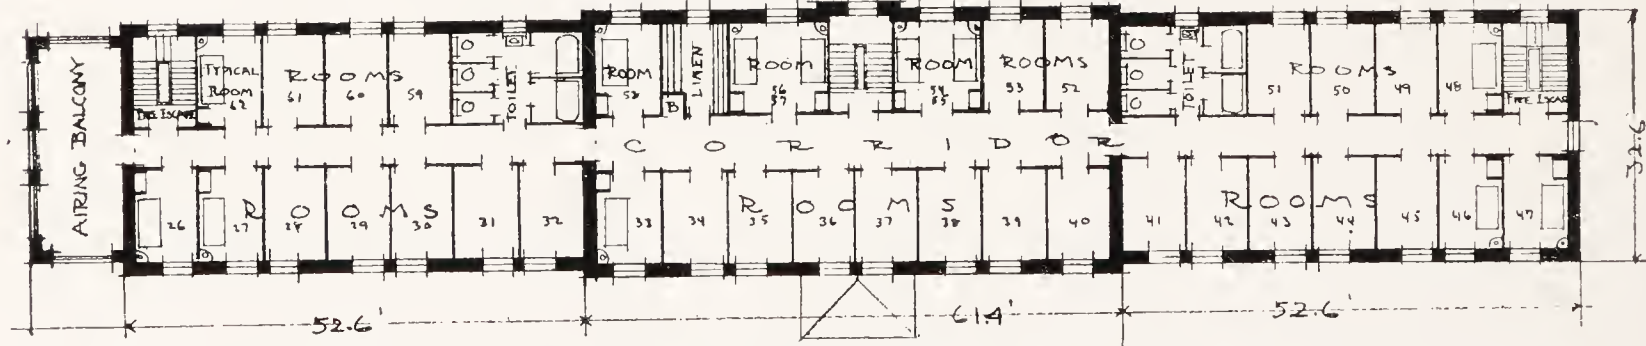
SECOND AND THIRD FLOORS, PROPOSED HELP'S BUILDING, KINGS COUNTY HOSPITAL, NEW YORK, N. Y.
